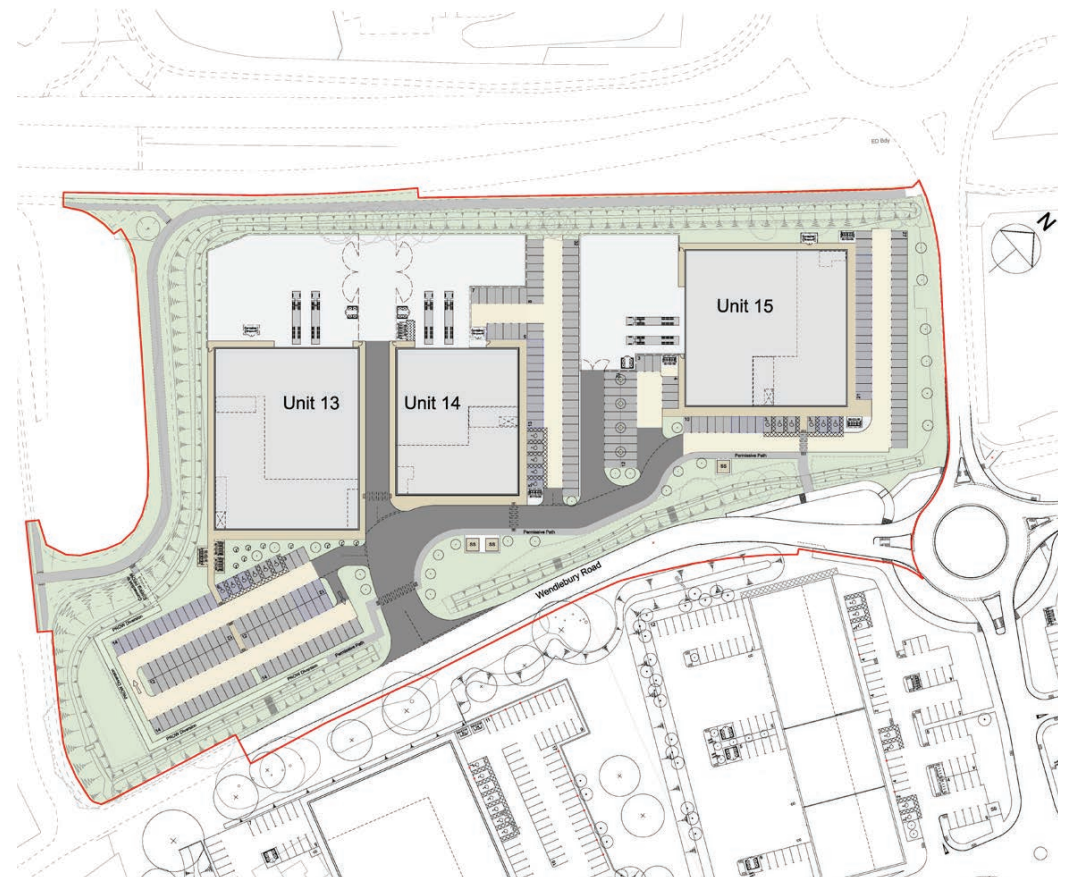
PROPOSED SITE FINISHES PLAN - NOT TO SCALE
